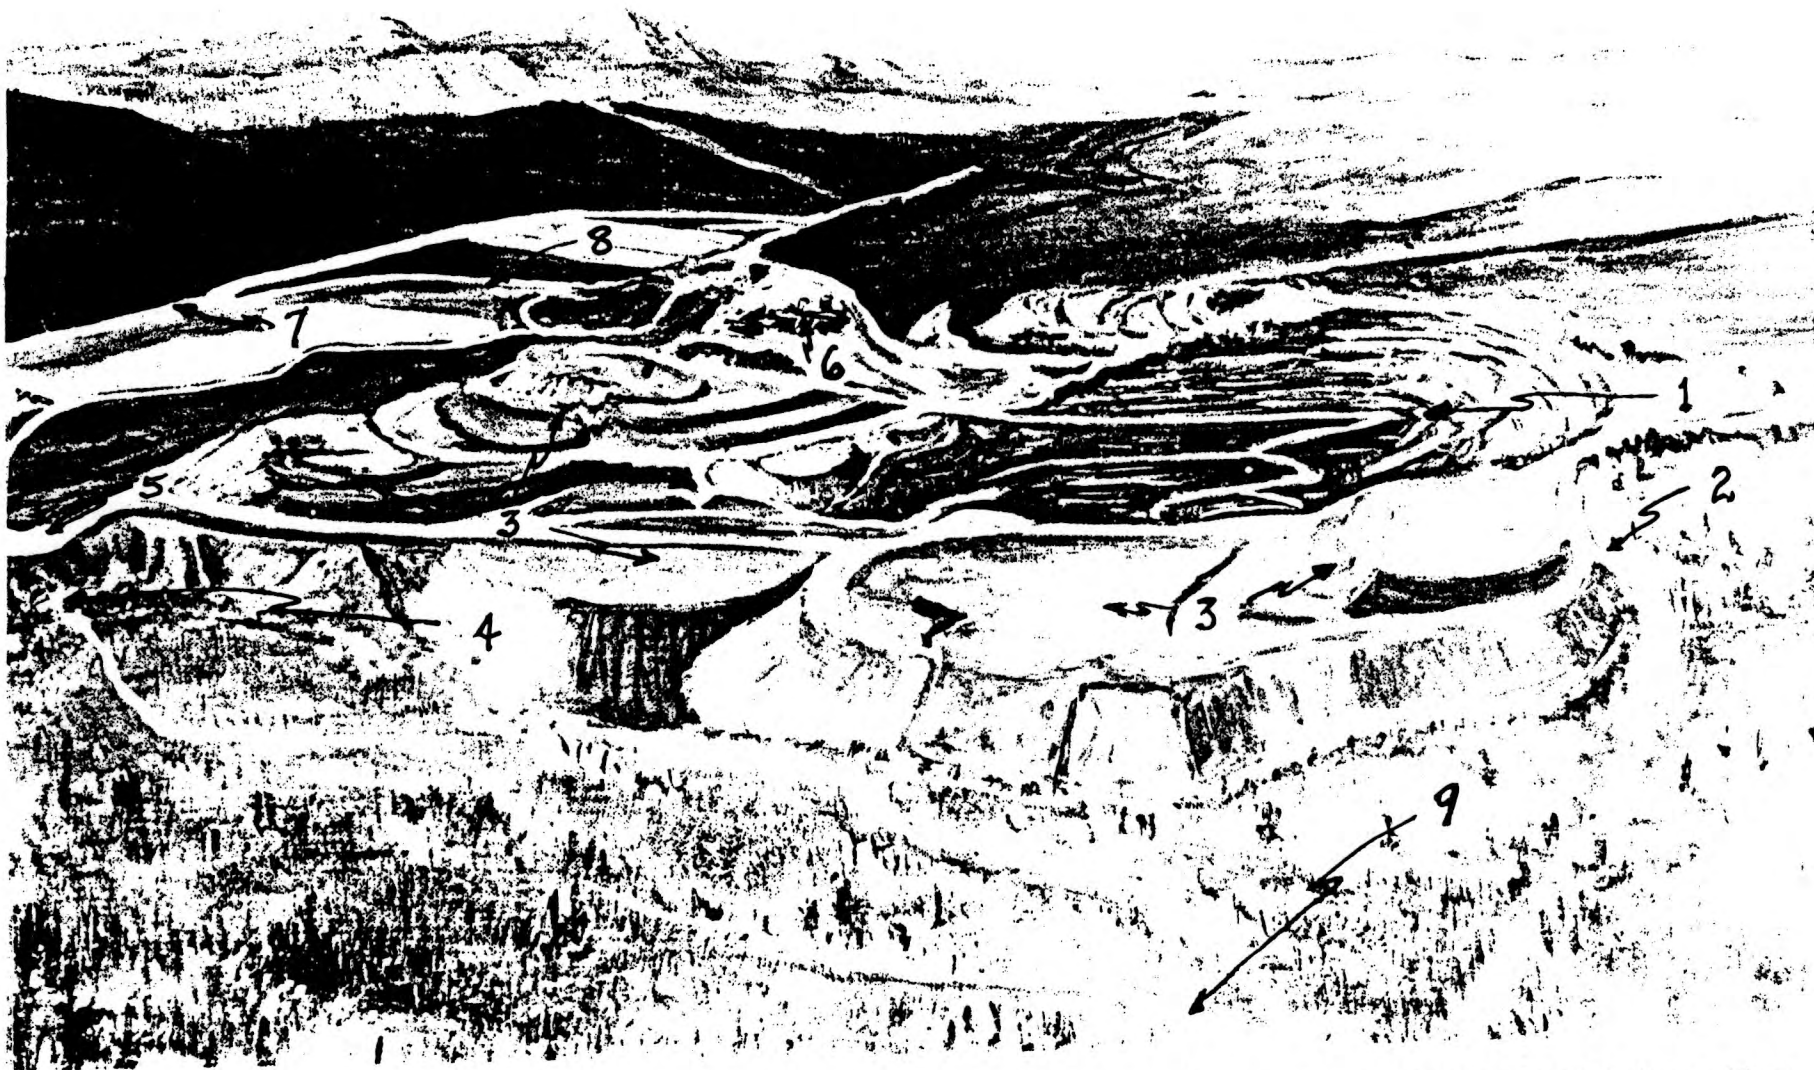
FARO MINE SITE - EXISTING - The Faro Pit and Waste Rock Dumps when mining is completed and before tailings deposition in the Pit begins. The Rose Creek Tailings Area is very near completion. Faro Creek is diverted around the pit into the North Fork of Rose Creek which flows through a rock drain under the Vangorda Plateau Haul Road. The Rose Creek Diversion carries the flow above and around the Rose Creek Tailings Area.
